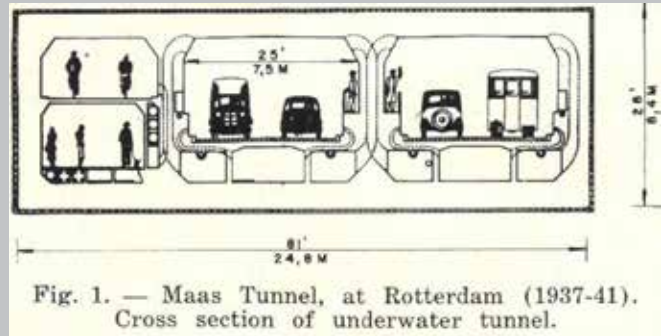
Maas Tunnel, at Rotterdam (1937-41). Cross section of underwater tunnel.
